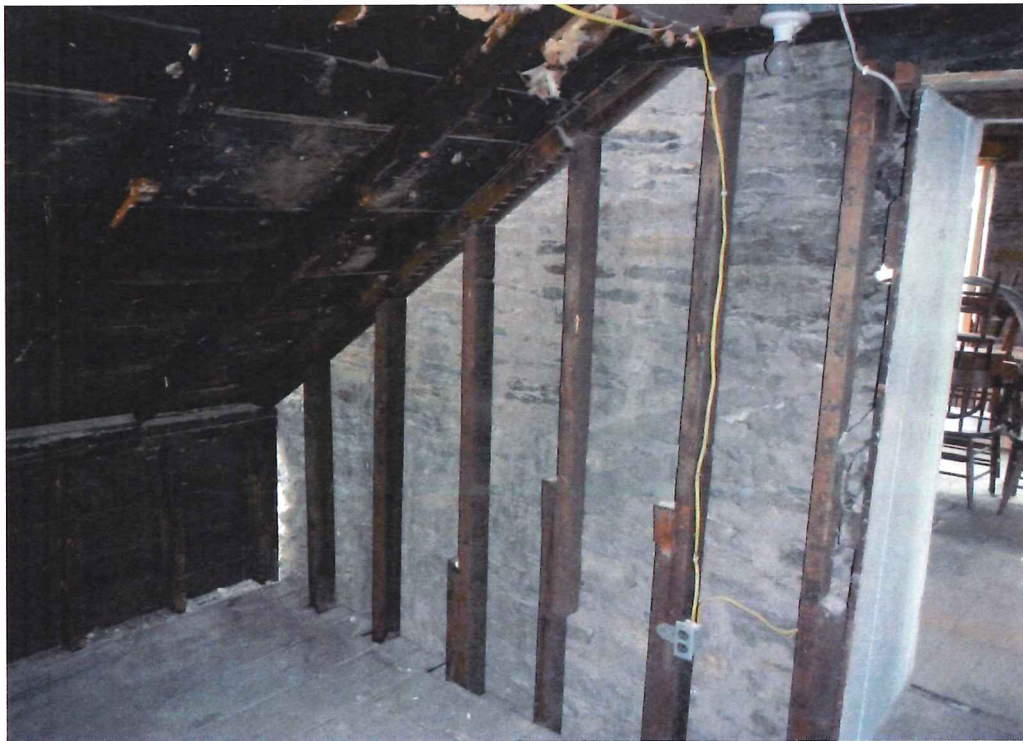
Sistered wall studs along east gable end at previous remodeling efforts
